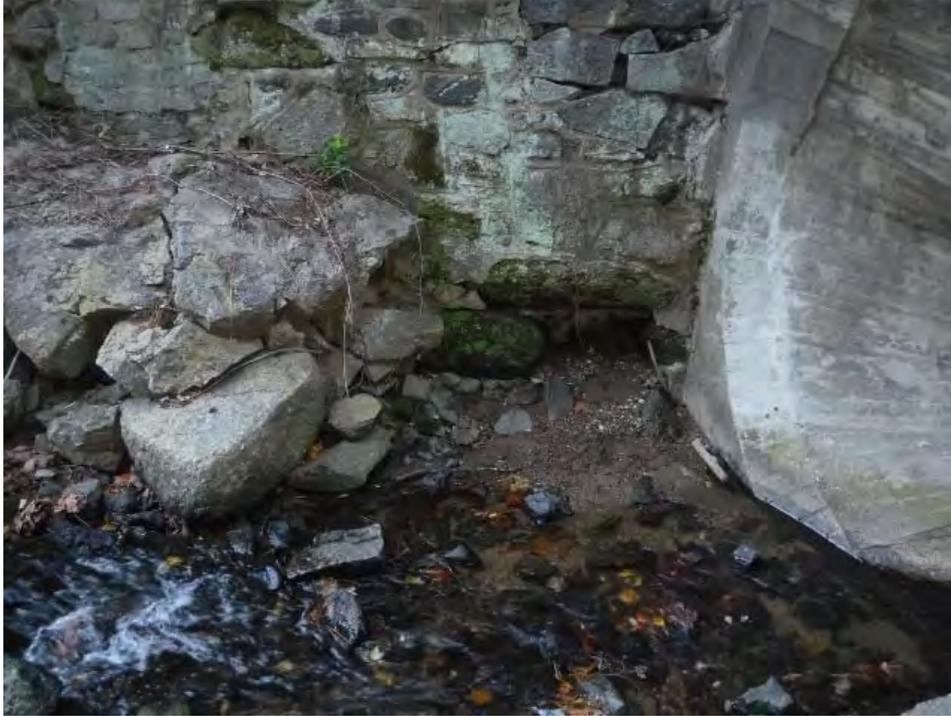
Leaning Portion of Section 8, Looking West.
